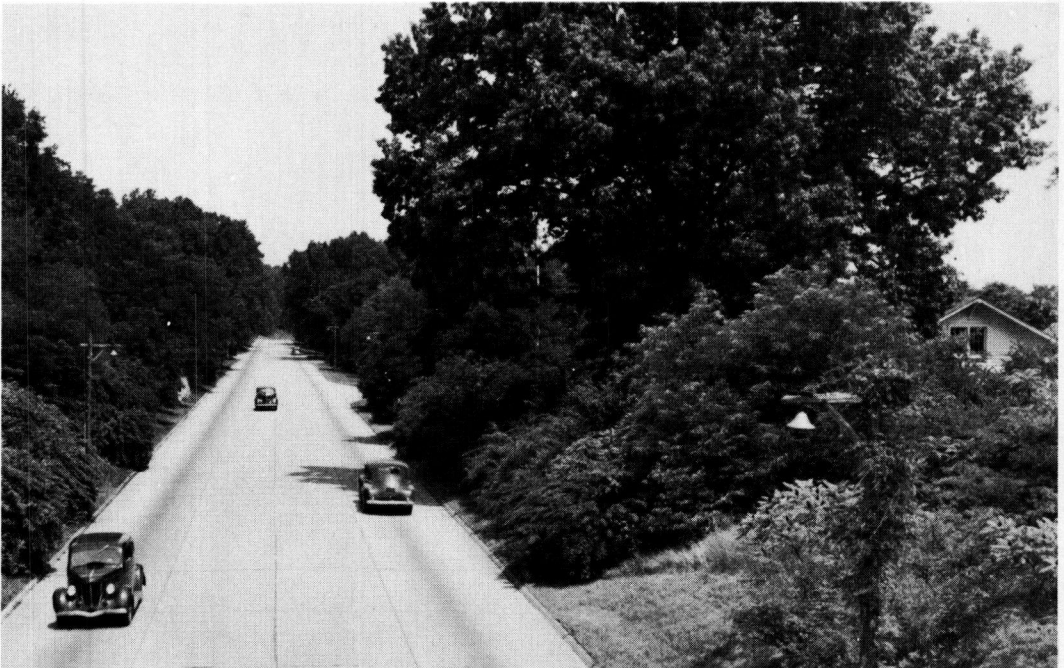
A depressed section of highway. The planting on the right 'insulates' the house from traffic noise. It serves the dual purpose of screening traffic from sight and sound. (Photo, courtesy of Bureau of Public Roads.)
